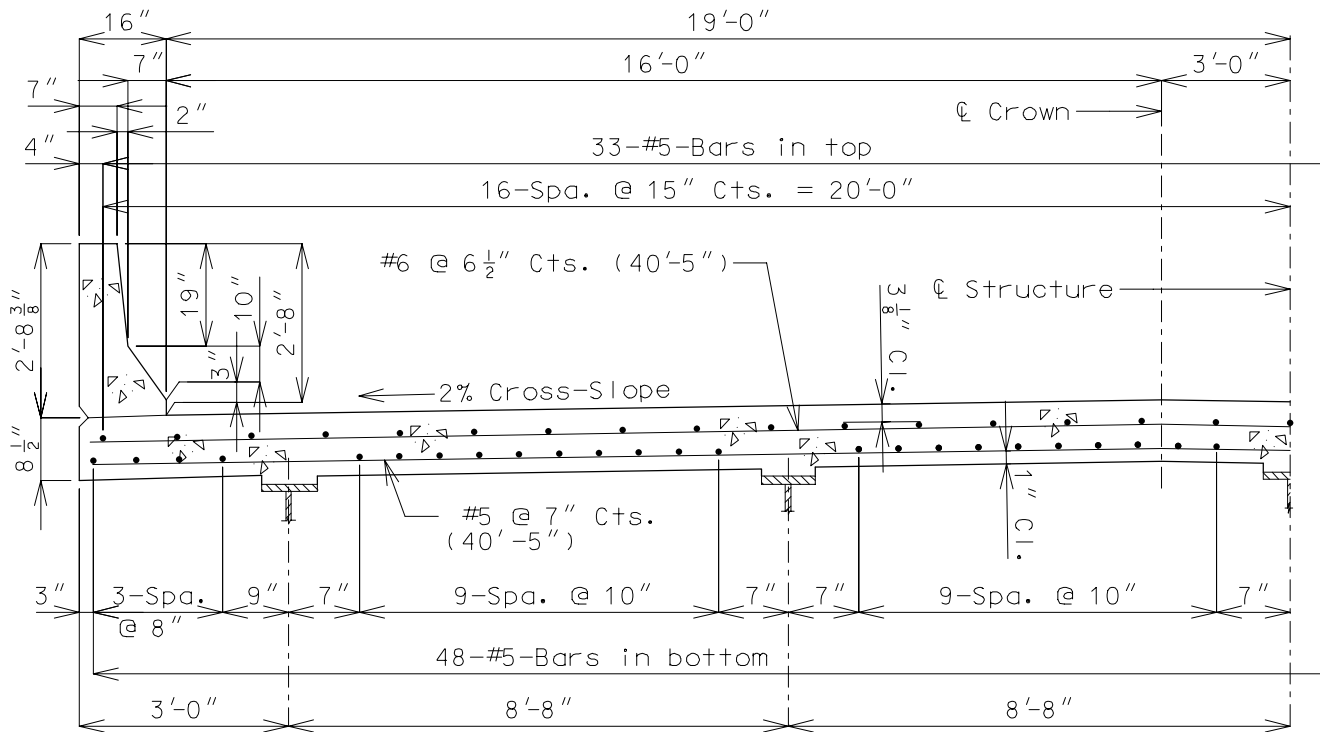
## DETAILS OF CONCRETE SLABS FOR STRUCTURES (CONT.)
